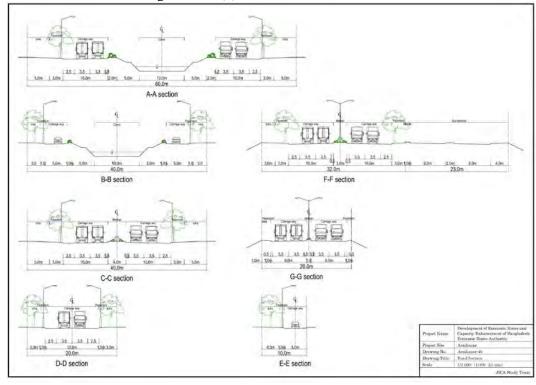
(4)-2 Araihazar road cross-section plan
